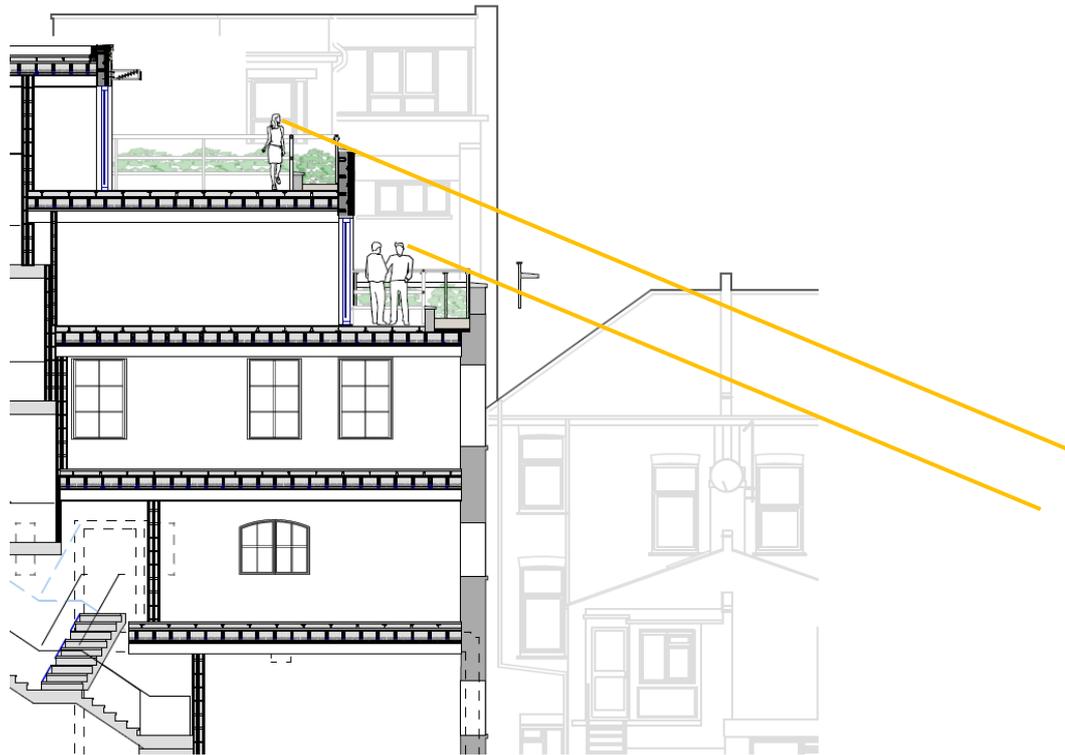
Section showing the proposed roof terraces to third and fourth floors. Orange lines show indicative views from the roof terraces
